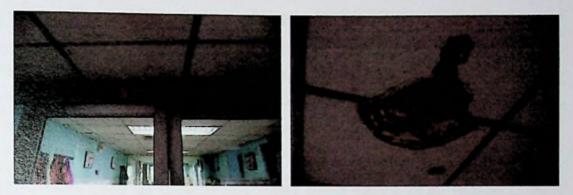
Ceiling affected due to condensation Nine-story building - LRH
